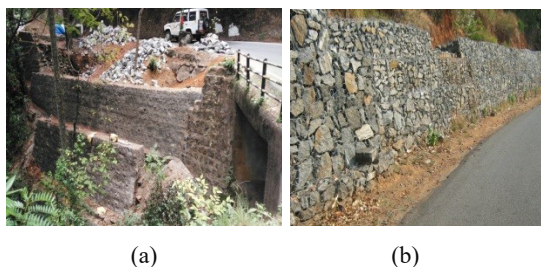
Remedial Measures; (a) View of retaining wall (b) View of gabion wall
